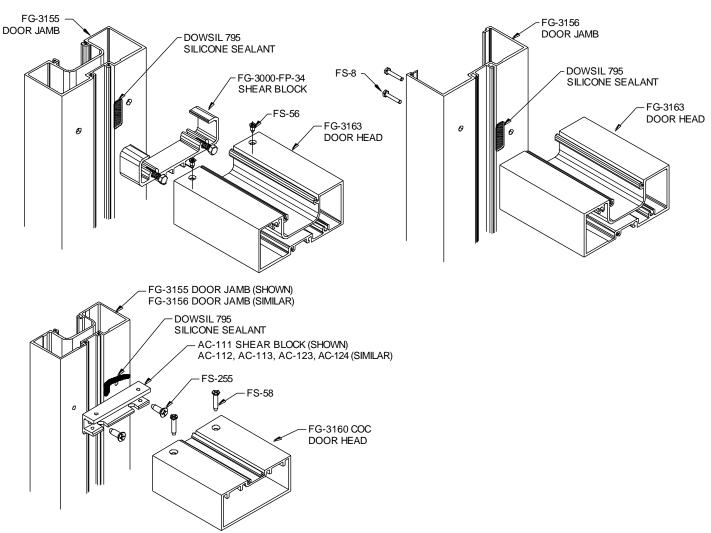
ArmorDefend™ Door Jamb to Door Head Connections
